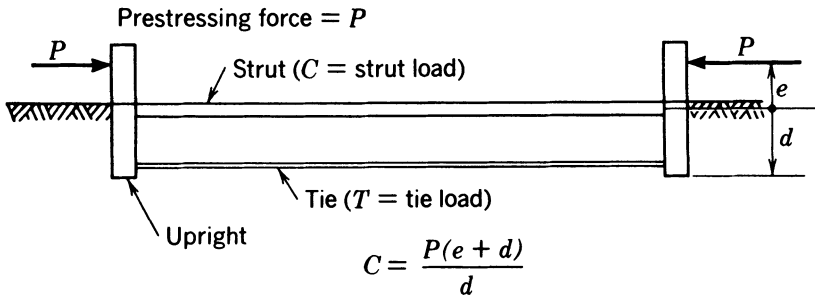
Elevation of strut-and-tie pretensioning bench.
